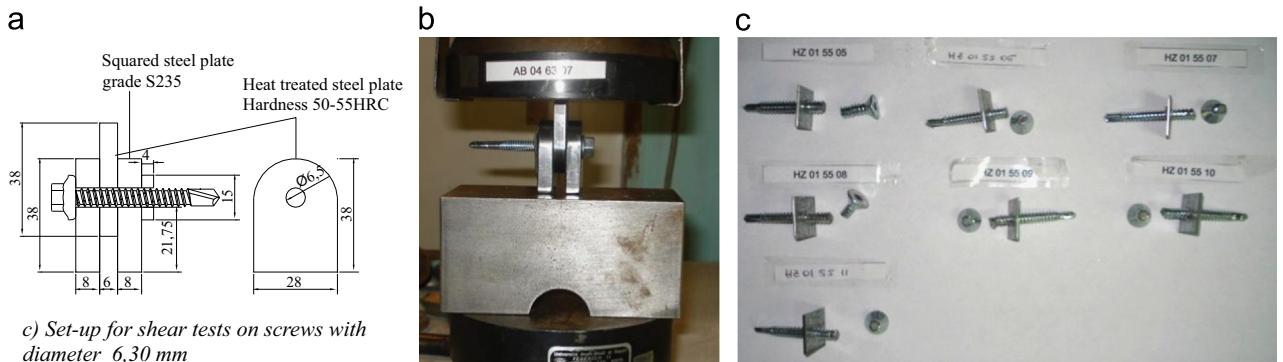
Shear screw test. (a) Test set up, (b) specimen and (c) collapse.
